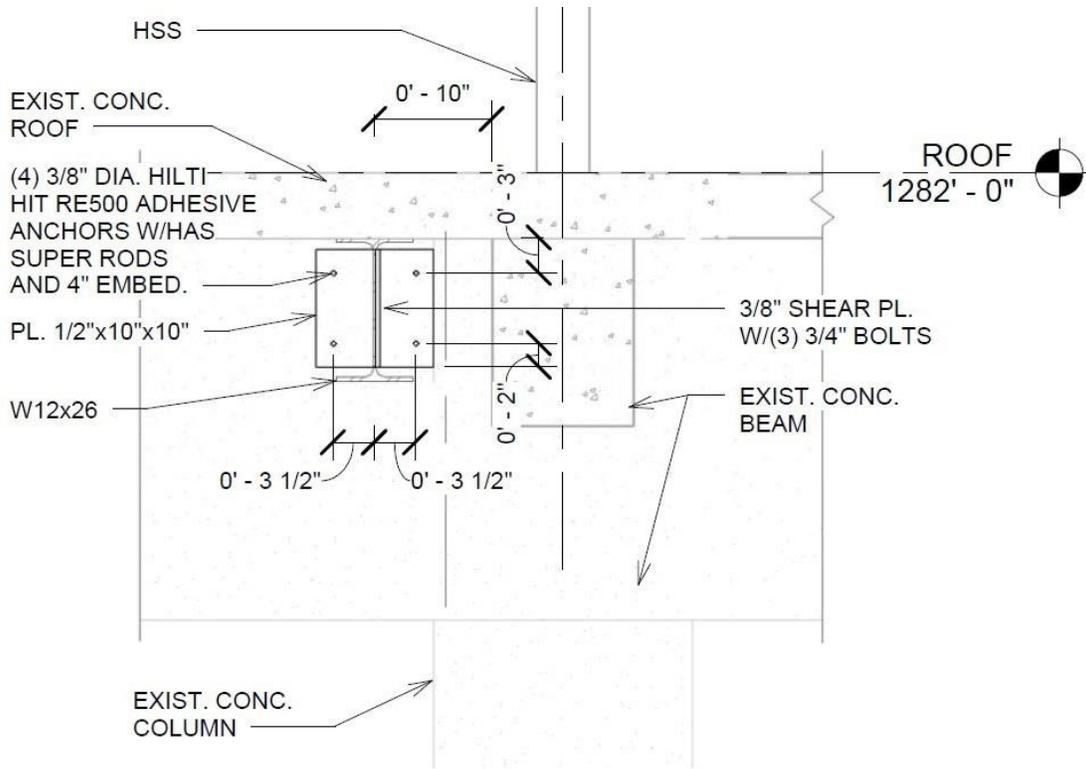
Section 10, detail of current roof reinforcement plan. (From project structural plans)
